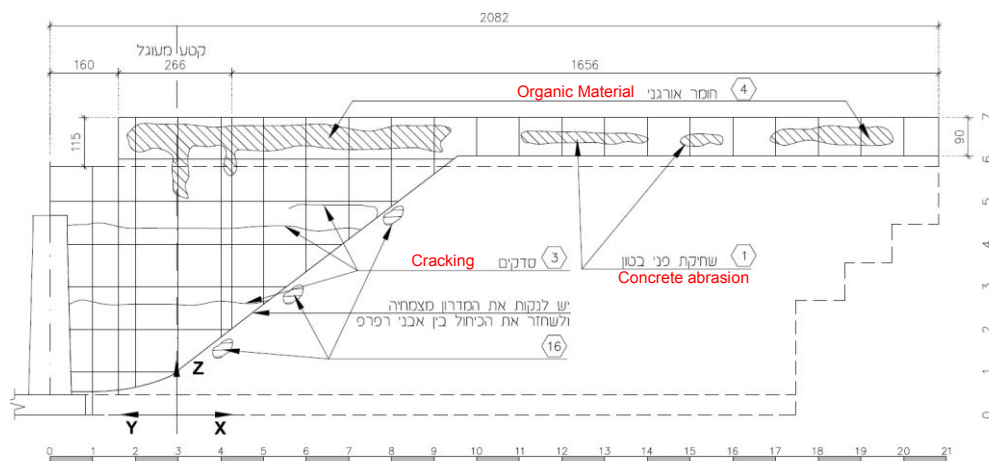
Elevation of Wingwall 3 with defects marking
